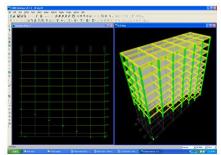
Typical 2D and 3D Step back building model on 20° slope
